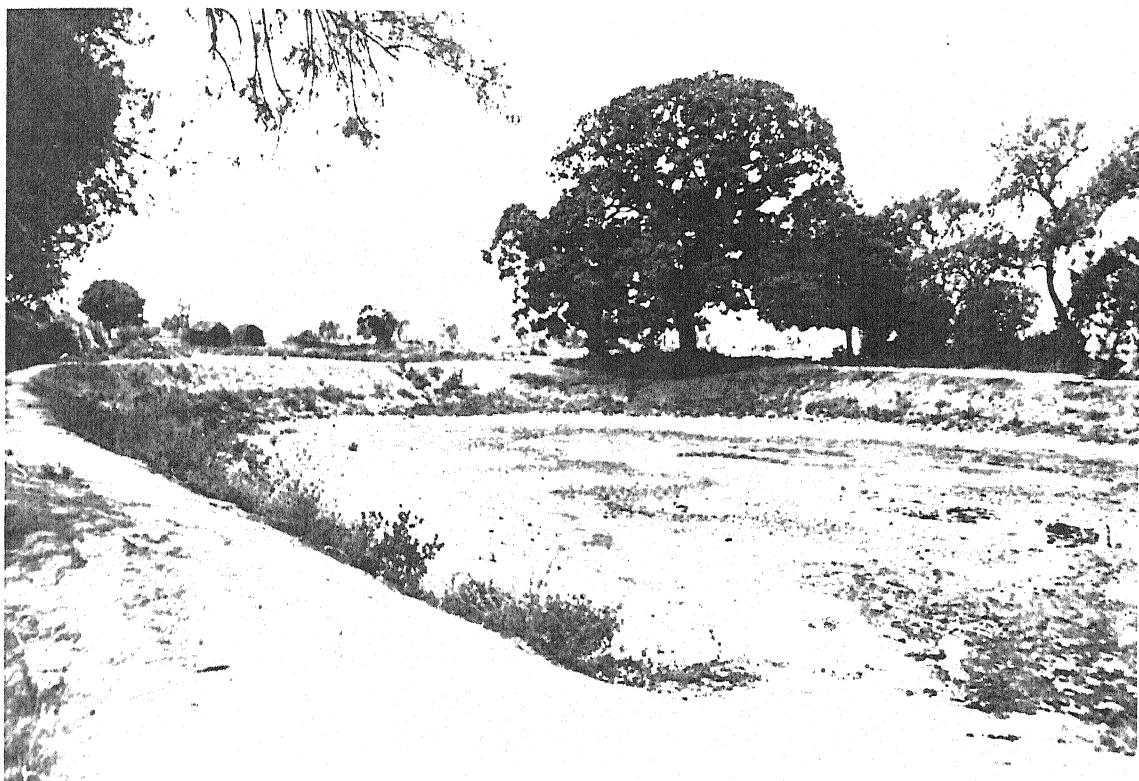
A pond of Tehra village, watershed Tehra-I was constructed from work fund.
